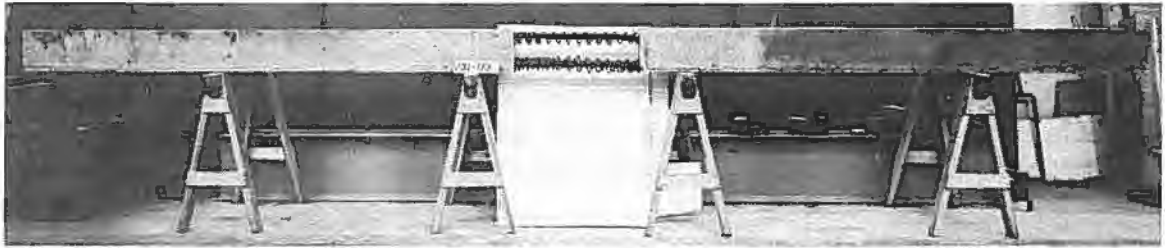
Beam 732-173. The two elements before casting of the joint in the middle of the beam.
